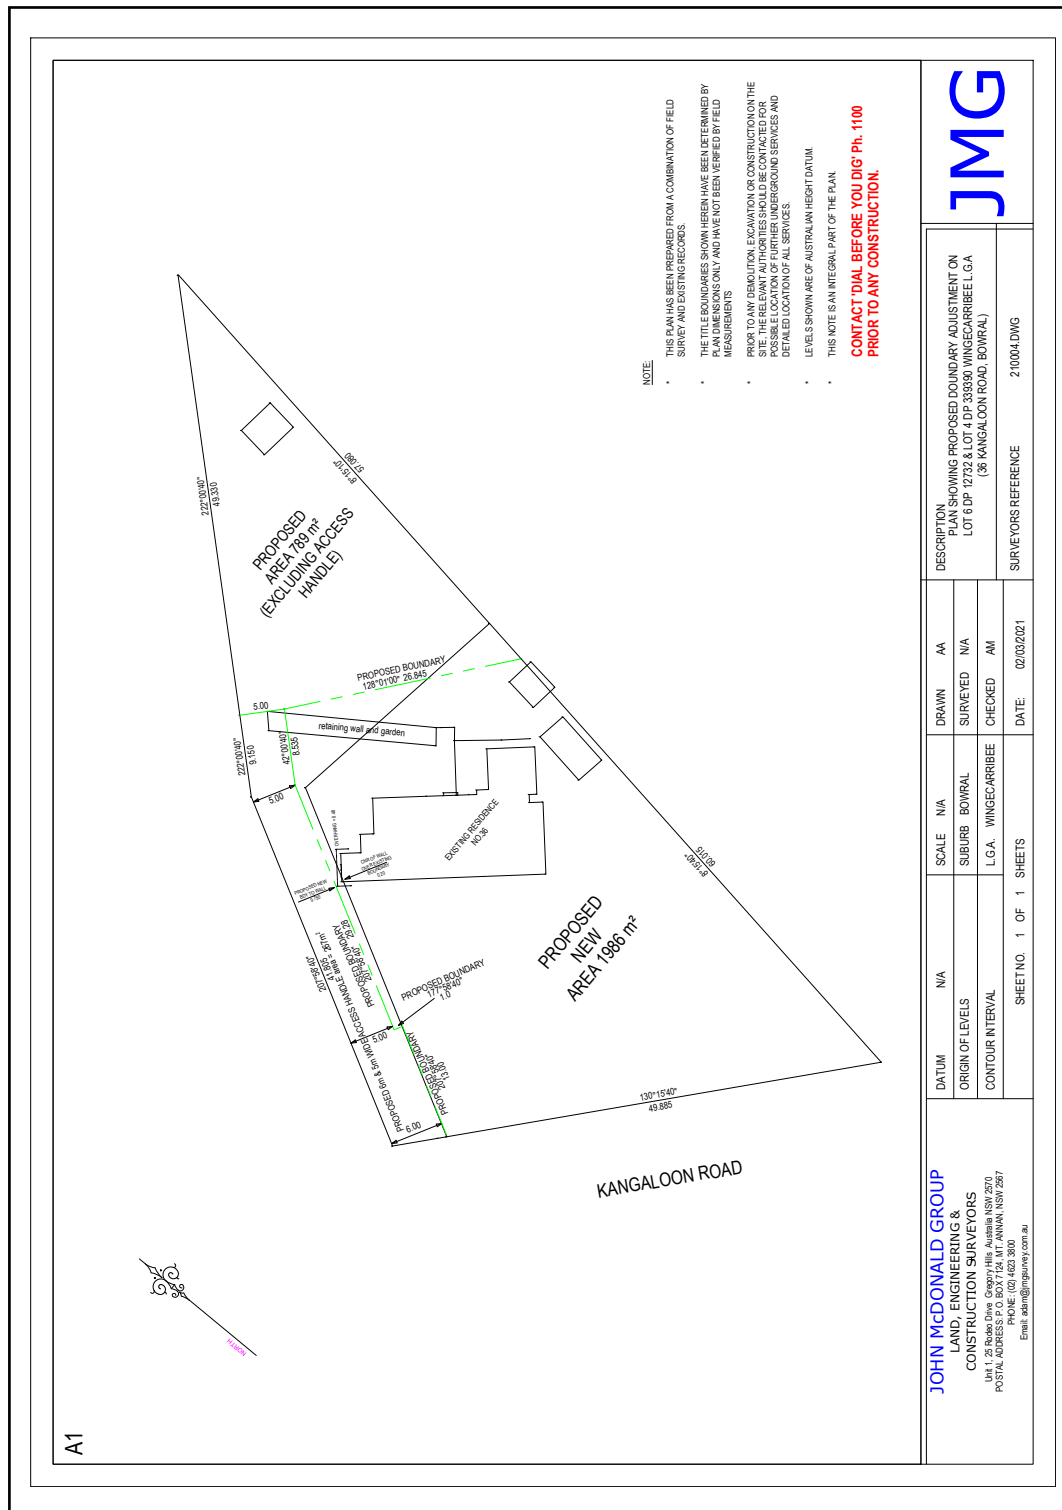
Proposed Plan of Subdivision prepared by JMG Surveyor
